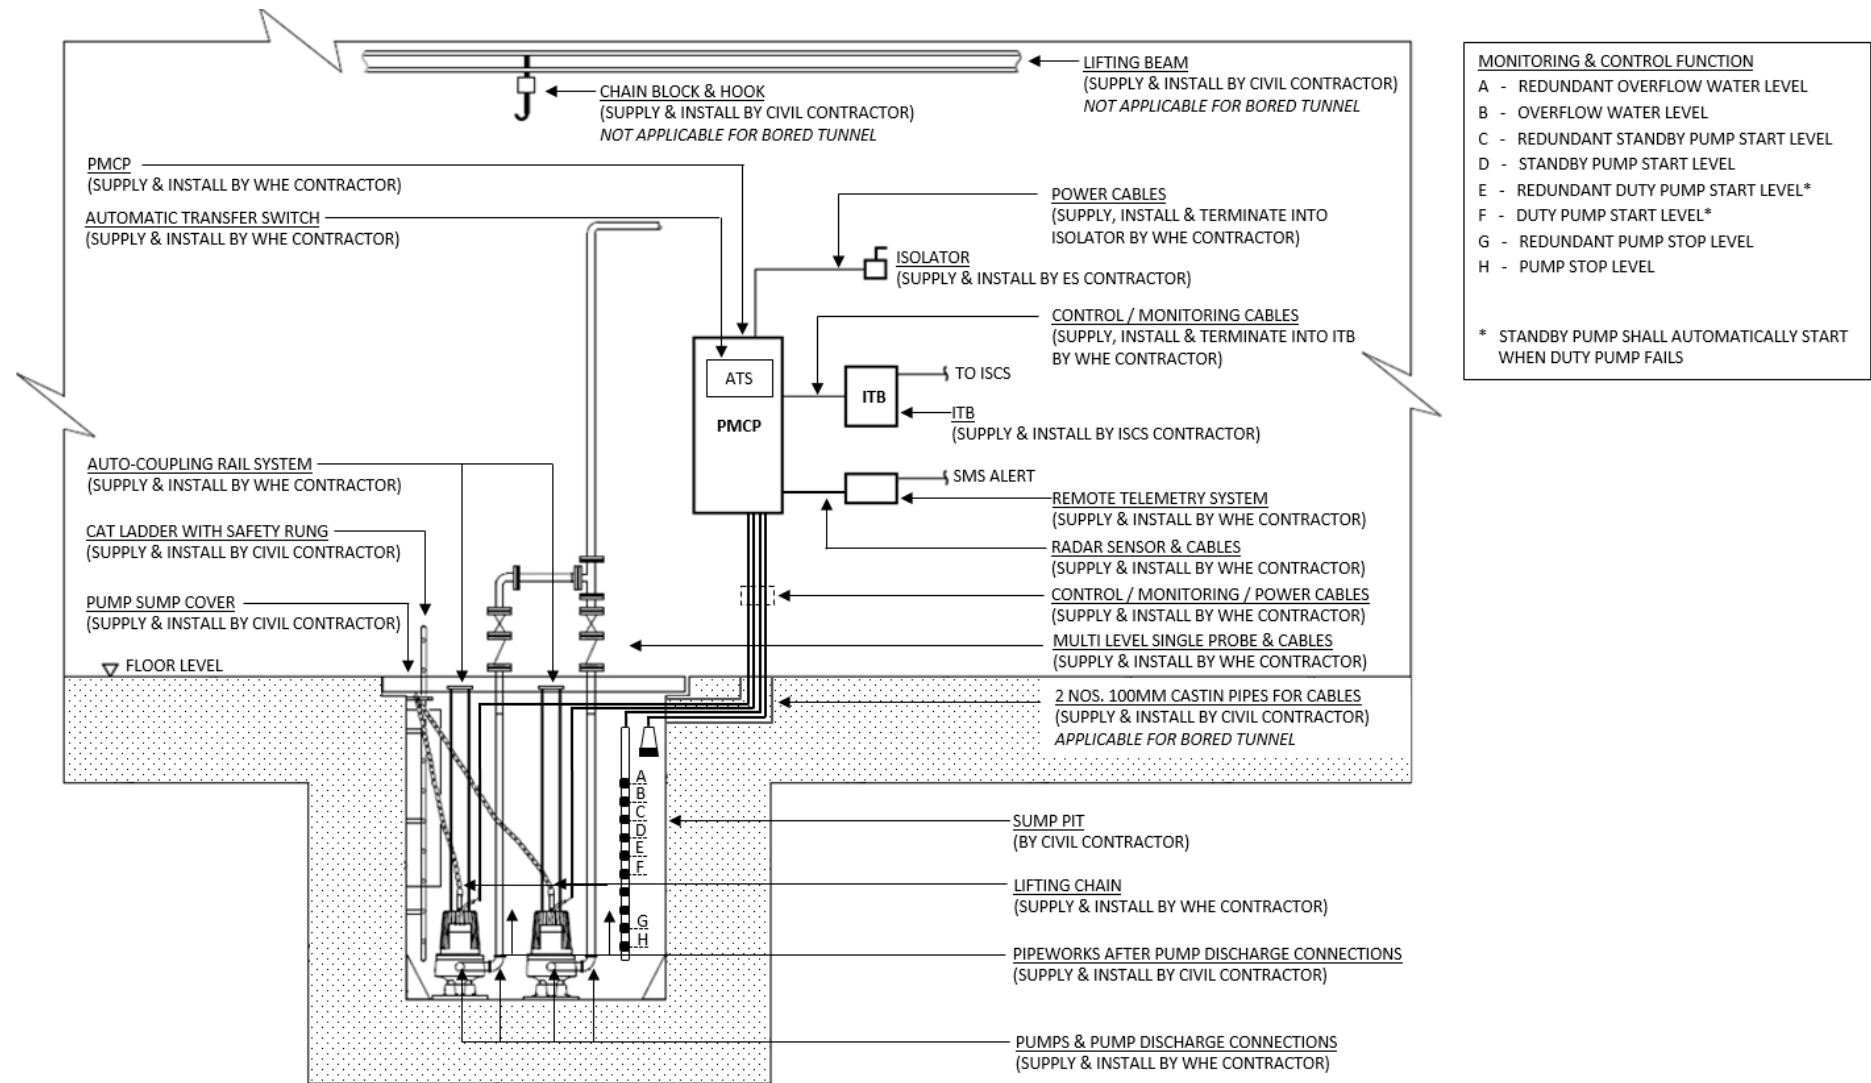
TYPICAL INTERFACE & INSTALLATION REQUIREMENTS OF TUNNEL DRAINAGE SUMP PUMPING SYSTEM
